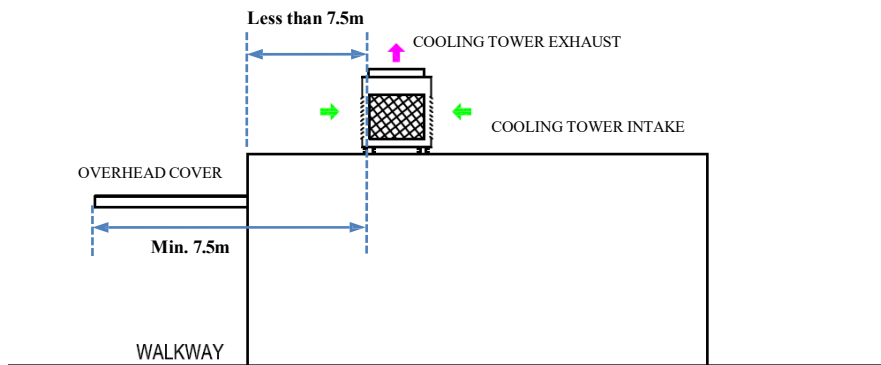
Cooling tower on roof with minimum 7.5m horizontal separation from surrounding air intakes and exhausts, operable windows and public access.
